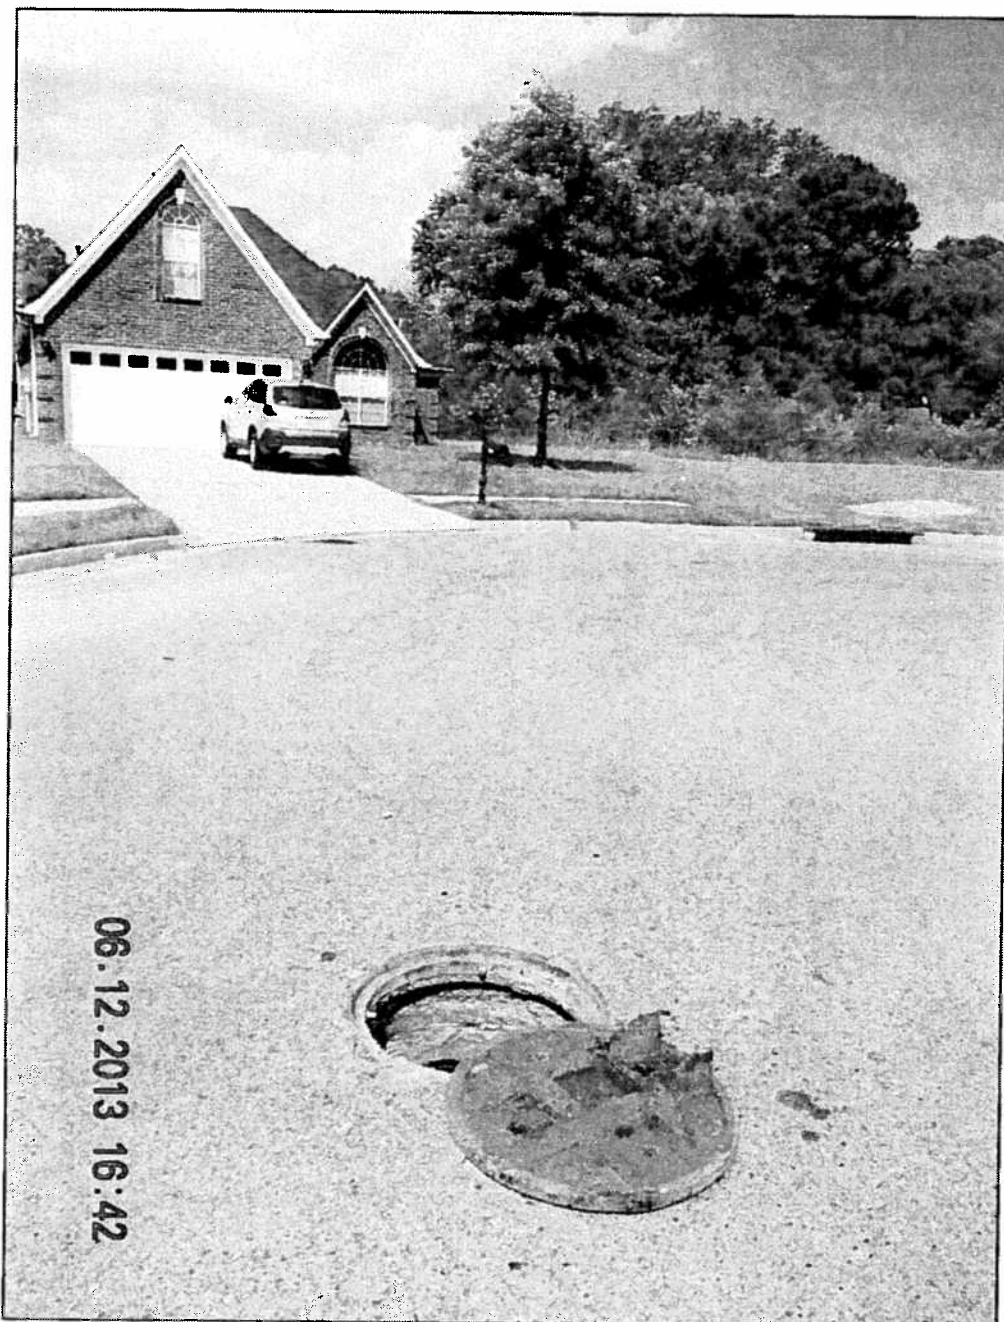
Manhole outside of 7134 Crape Myrtle Dr. (home in background). Note curb/gutter storm drain to the right of driveway.
